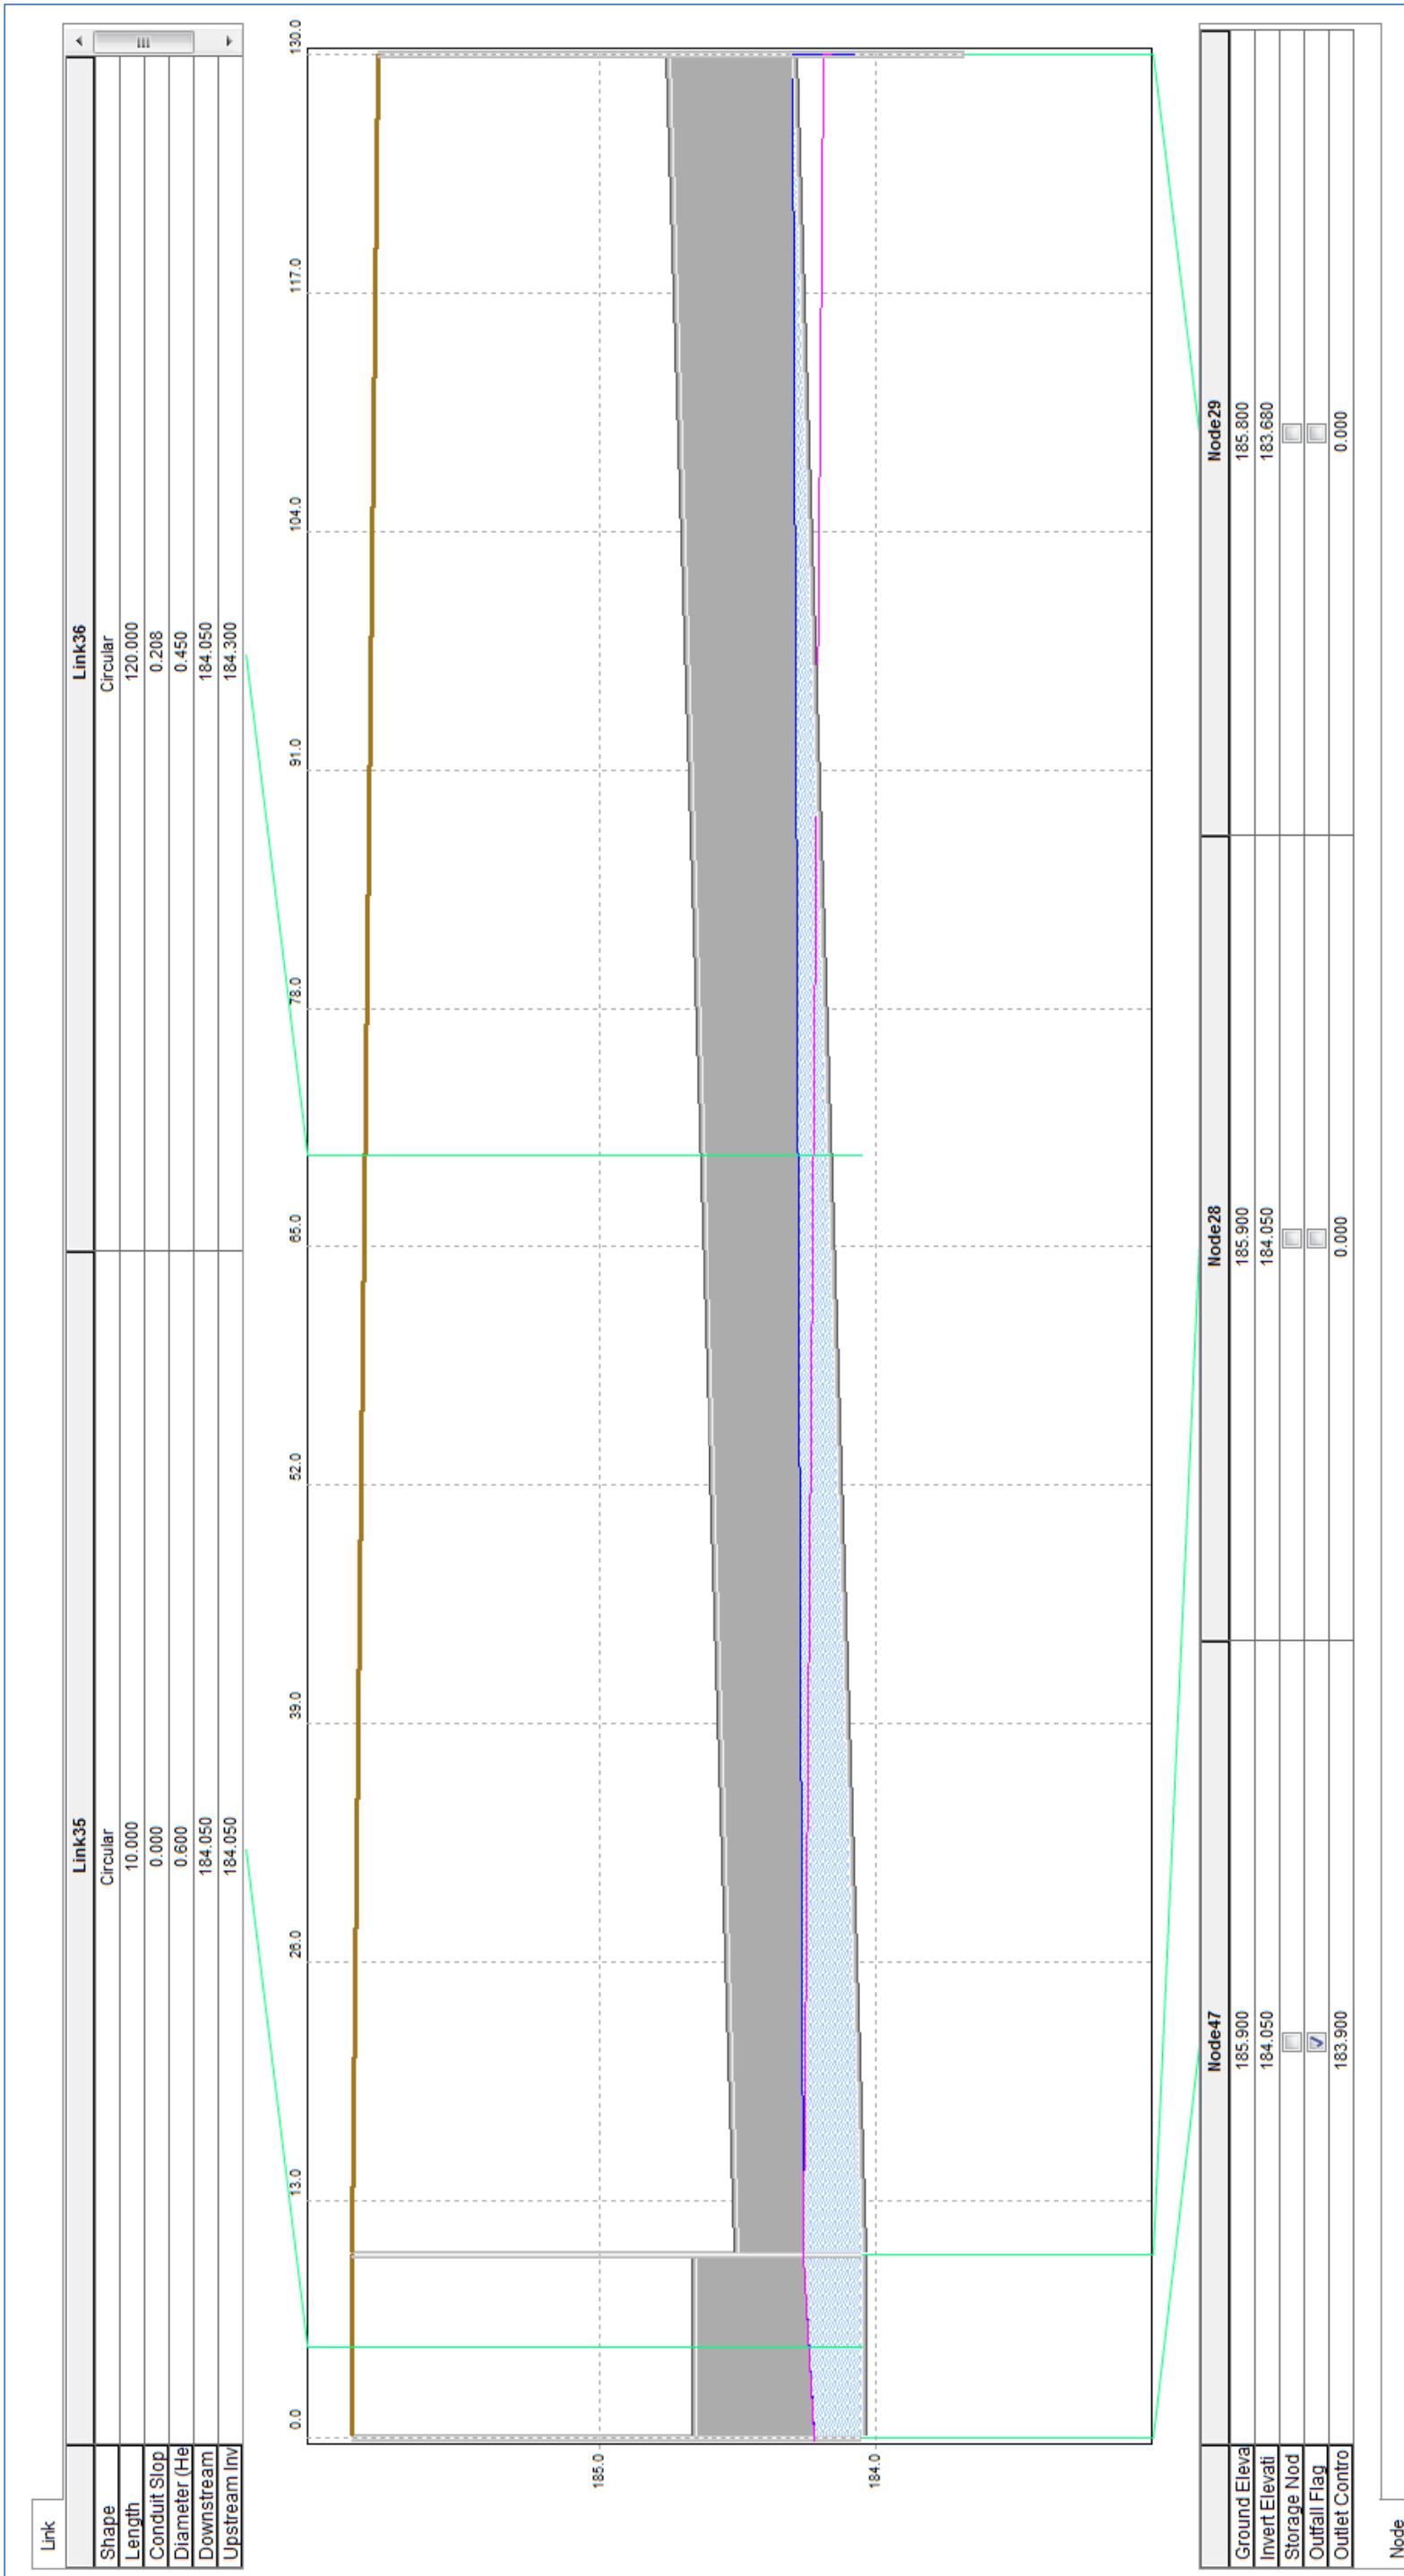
E-W Arterial (Sta. 12+780 - 12+900) - Permanent Pool Elevation Backwater Condition
